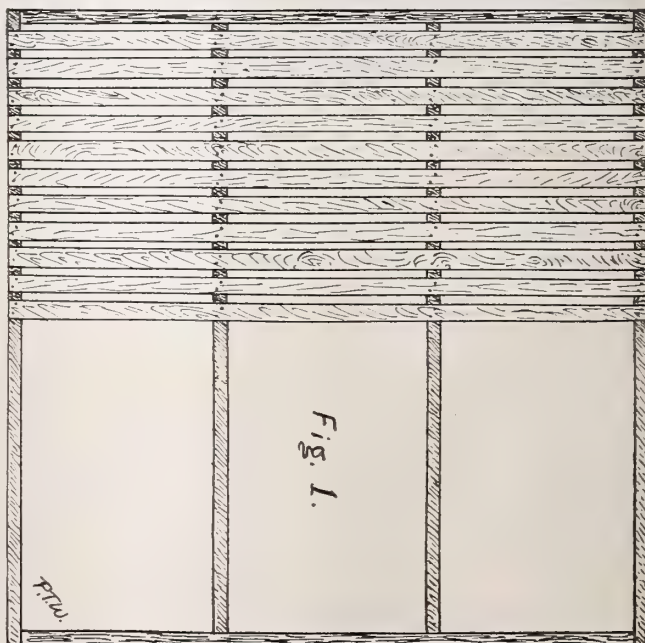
Plan of frame of floor of the Harris Open-Air Roost for Chicks. View shows how frame is built of 1 x 3-inch furring, placed inch edge up. Half of floor is shown covered with lath. Entire floor is covered with these lath placed half an inch apart. See Dr. Woods' article.
